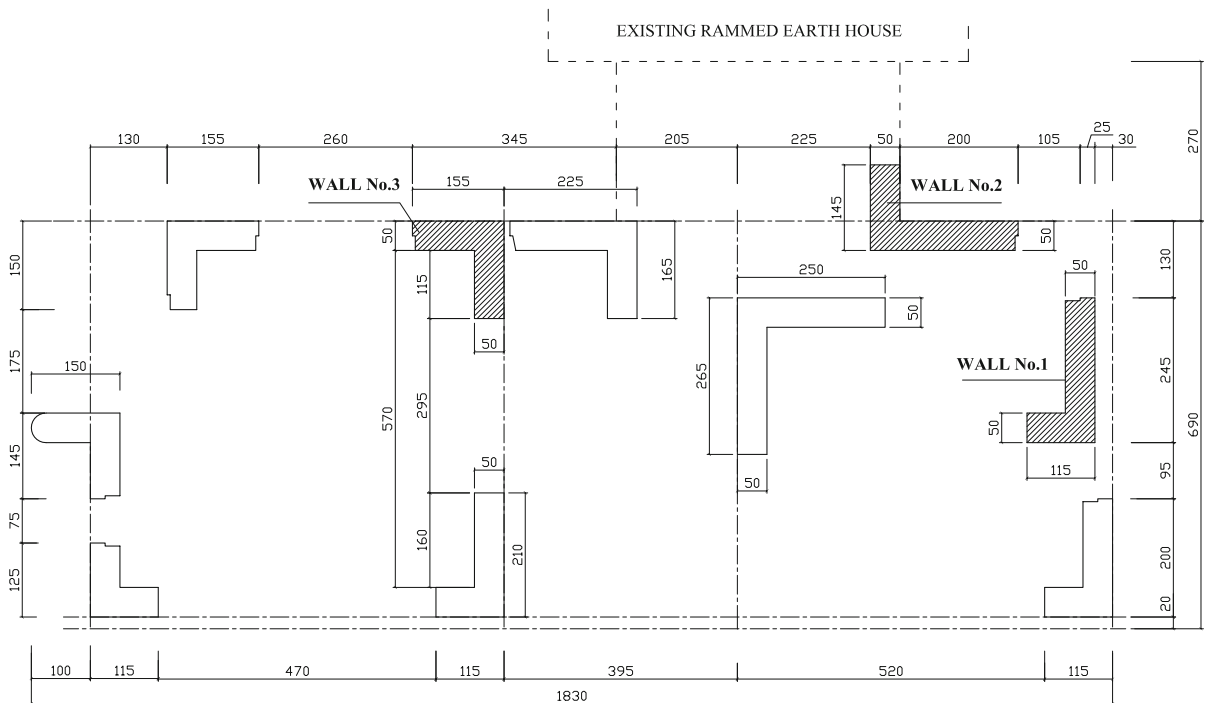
Plan of the rammed earth walls of the house and the location, dimensions (in cm) of the walls measured (No. 1, 2 and 3)
